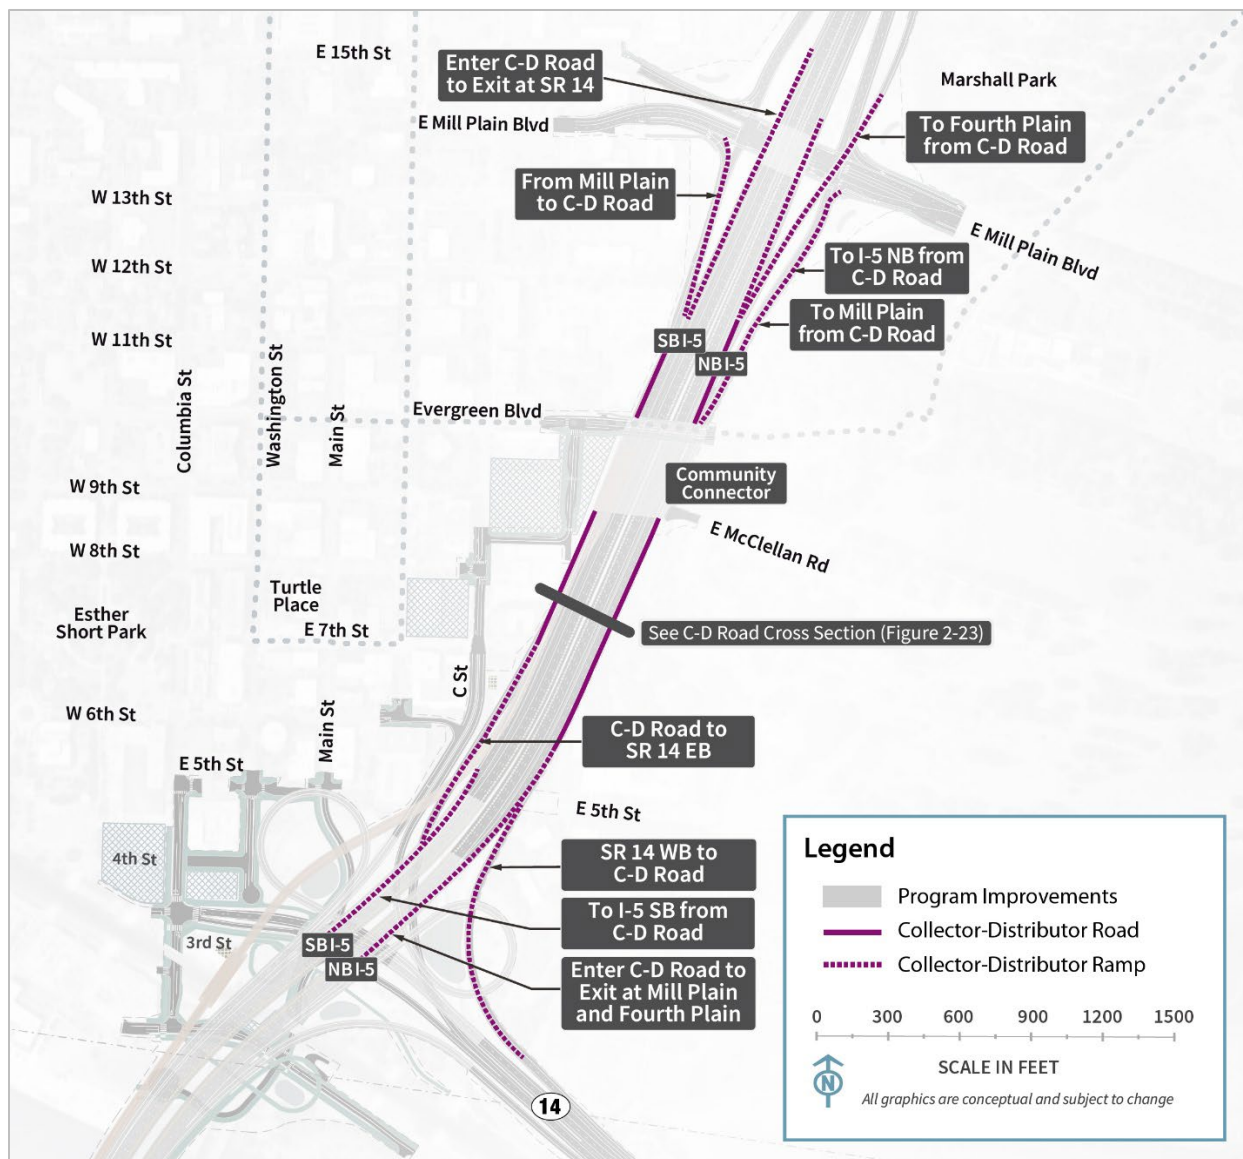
shows the location of the collector-distributor (C-D)¹¹ roadways in downtown Vancouver, and Figure 1-26 shows a typical cross section of the C-D roadways.
